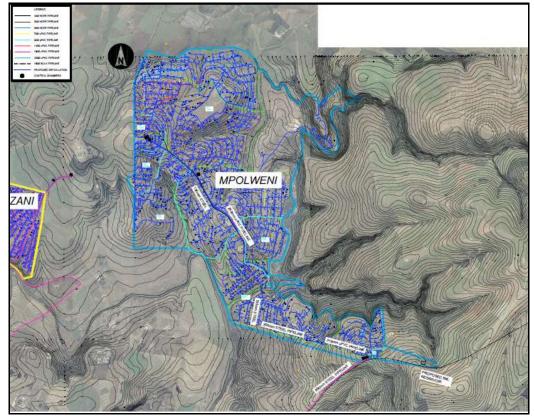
Aerial image showing proposed water layout at the site (Acknowledgement to Escongweni BPH Engineers (Pty) Ltd)
